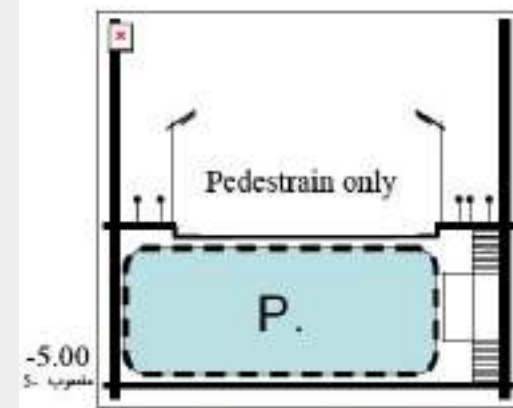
the underground parking areas that are located under the pedestrian streets
